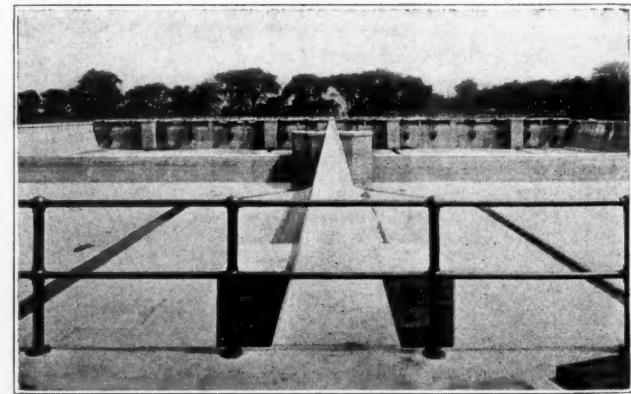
SECONDARY SEPTIC TANKS. FROM CENTER OF SOUTH WALL
